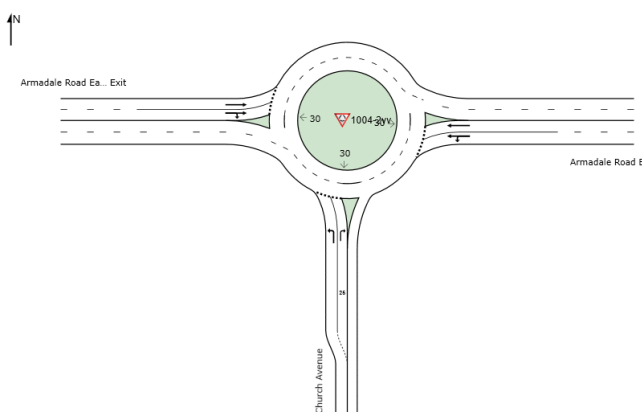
Armadale Road/ Church Avenue – Roundabout option
